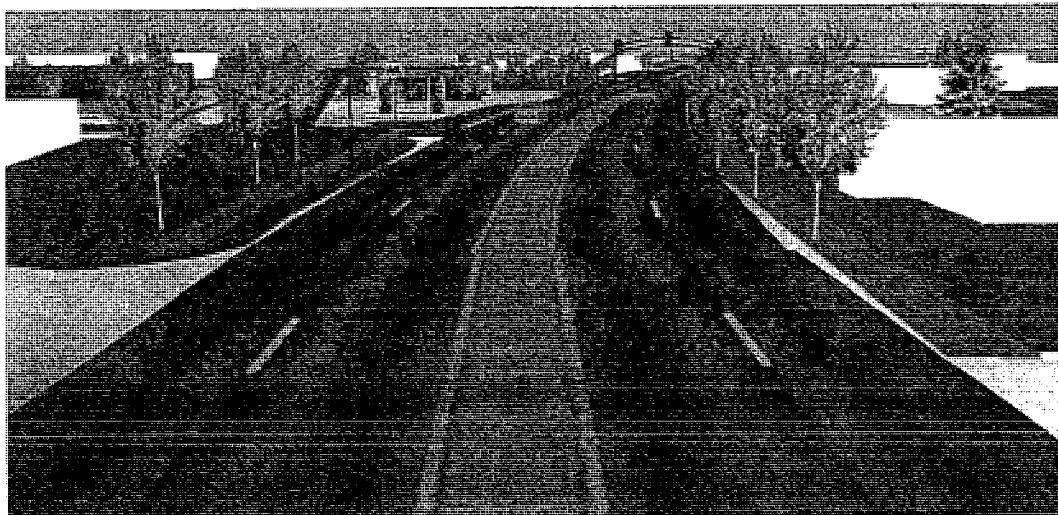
This view is Option 2 looking south near the 14th Avenue and Washington Street intersection on Lincoln Road.
